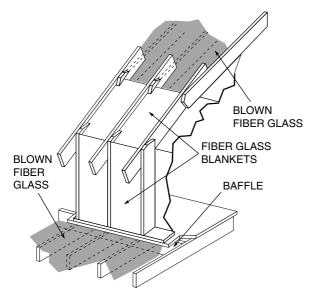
Attic knee walls and slopes. (NAIMA)
